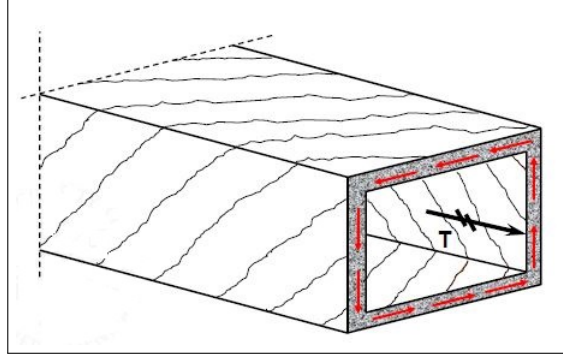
Thin walled cross section subjected to torsional load  $T$
